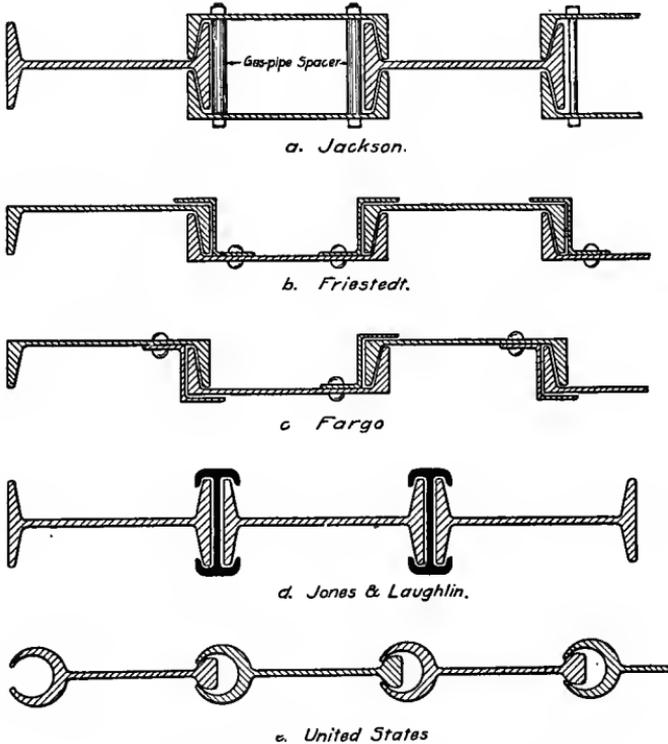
TYPICAL FORMS OF STEEL SHEET PILES.
